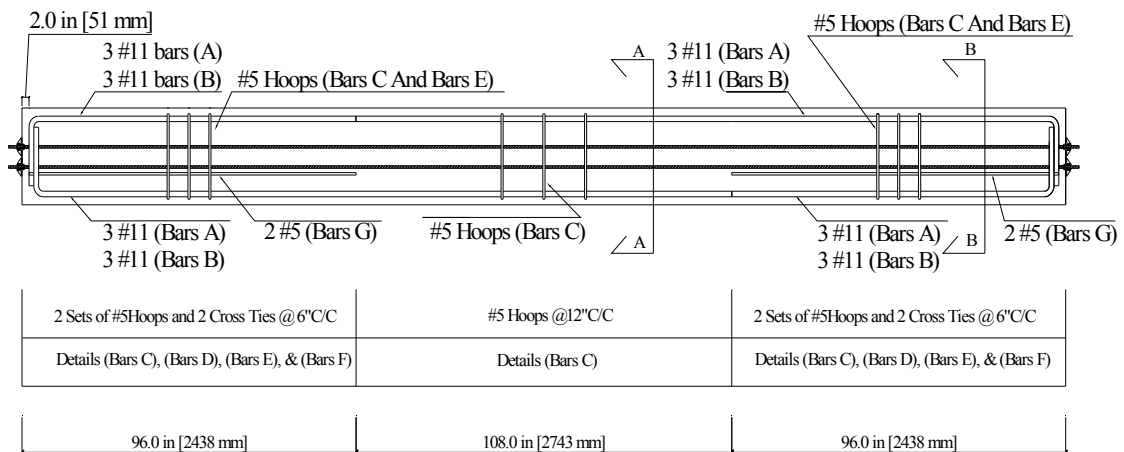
Sample TxDOT Column Reinforcement Detail
